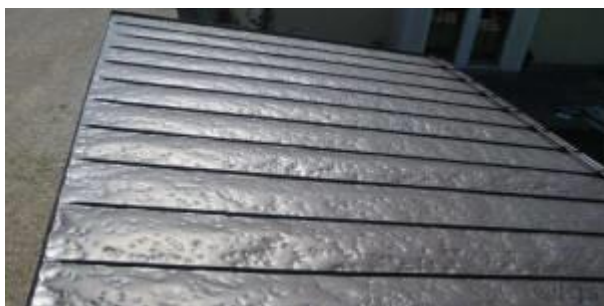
Visible damage of metal-sheet roofing (source: EPZ)
